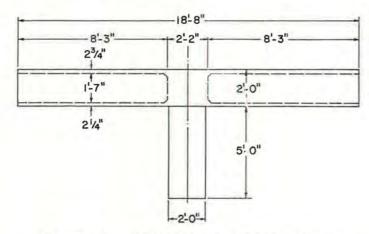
Elevation of single-column bents SC-3, SF-4, and SF-5.
